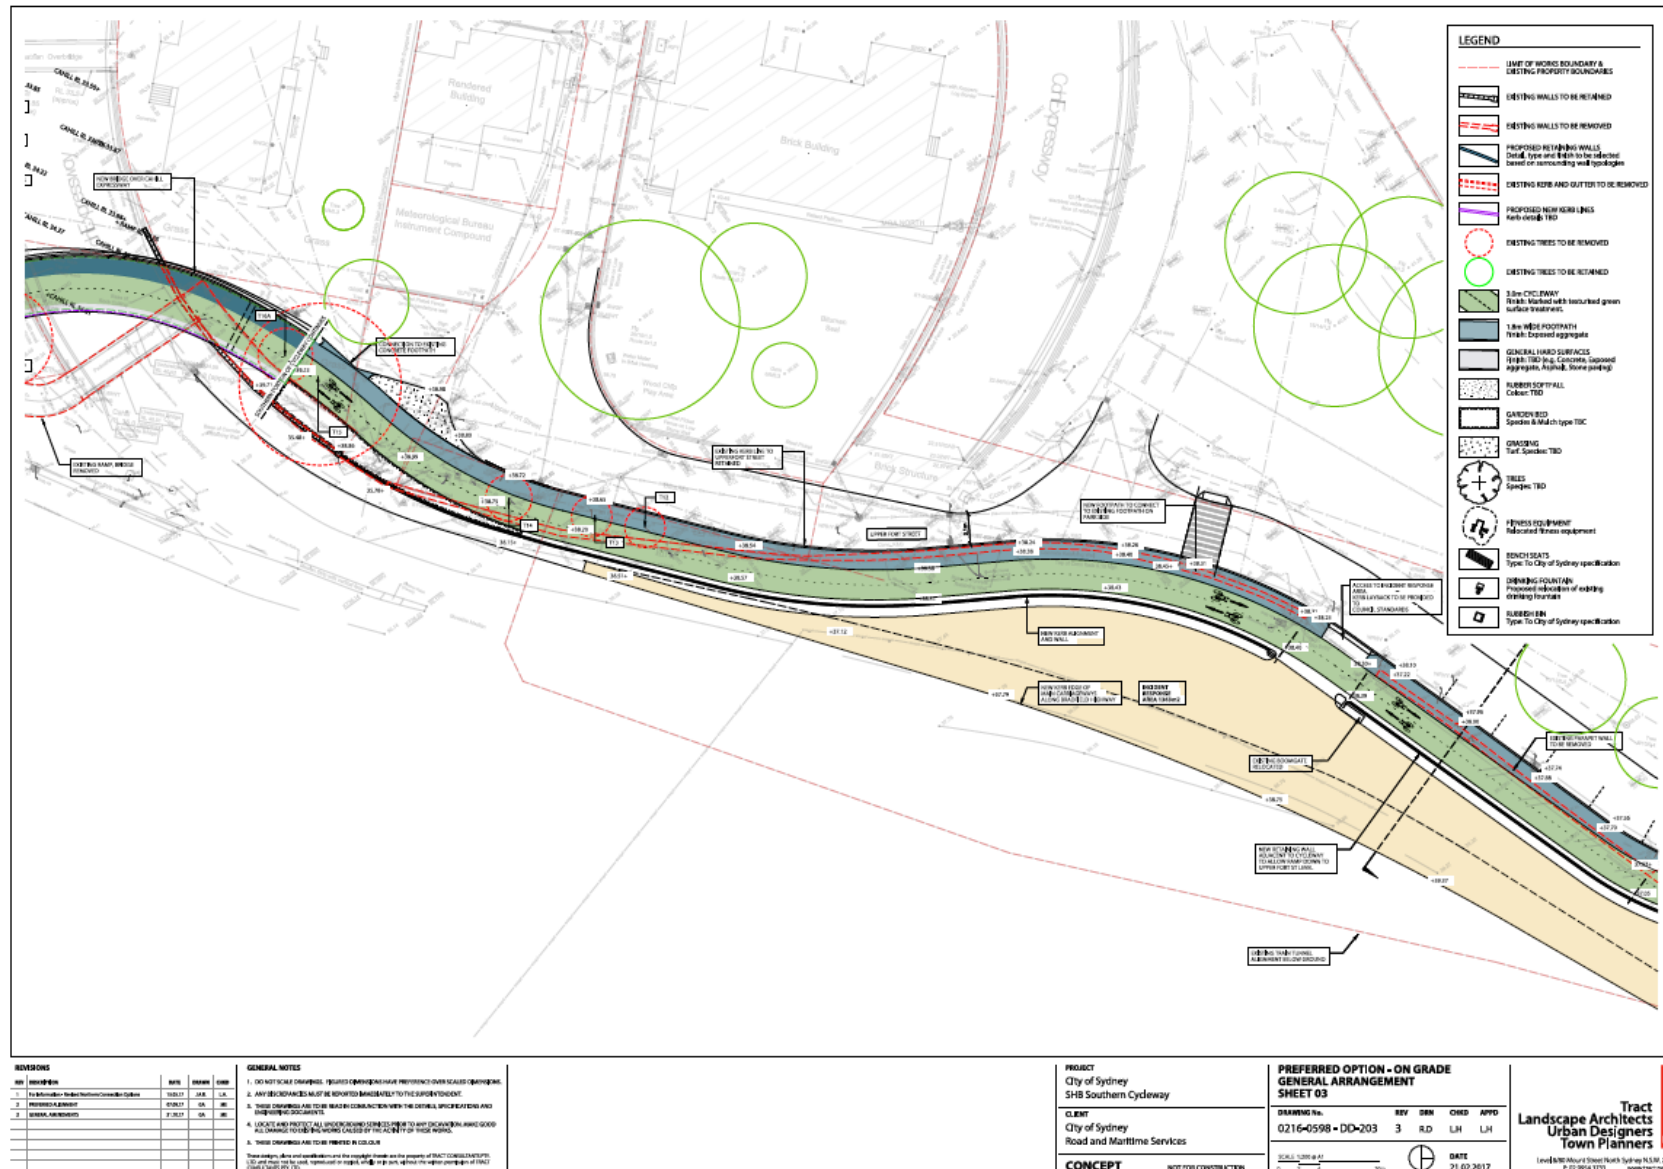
Plan of proposed SHB southern cycleway. (Source: Tract)
